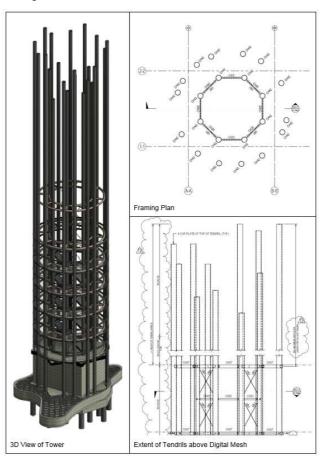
Dimensional drawing in plan and section. Isometric of tower.
